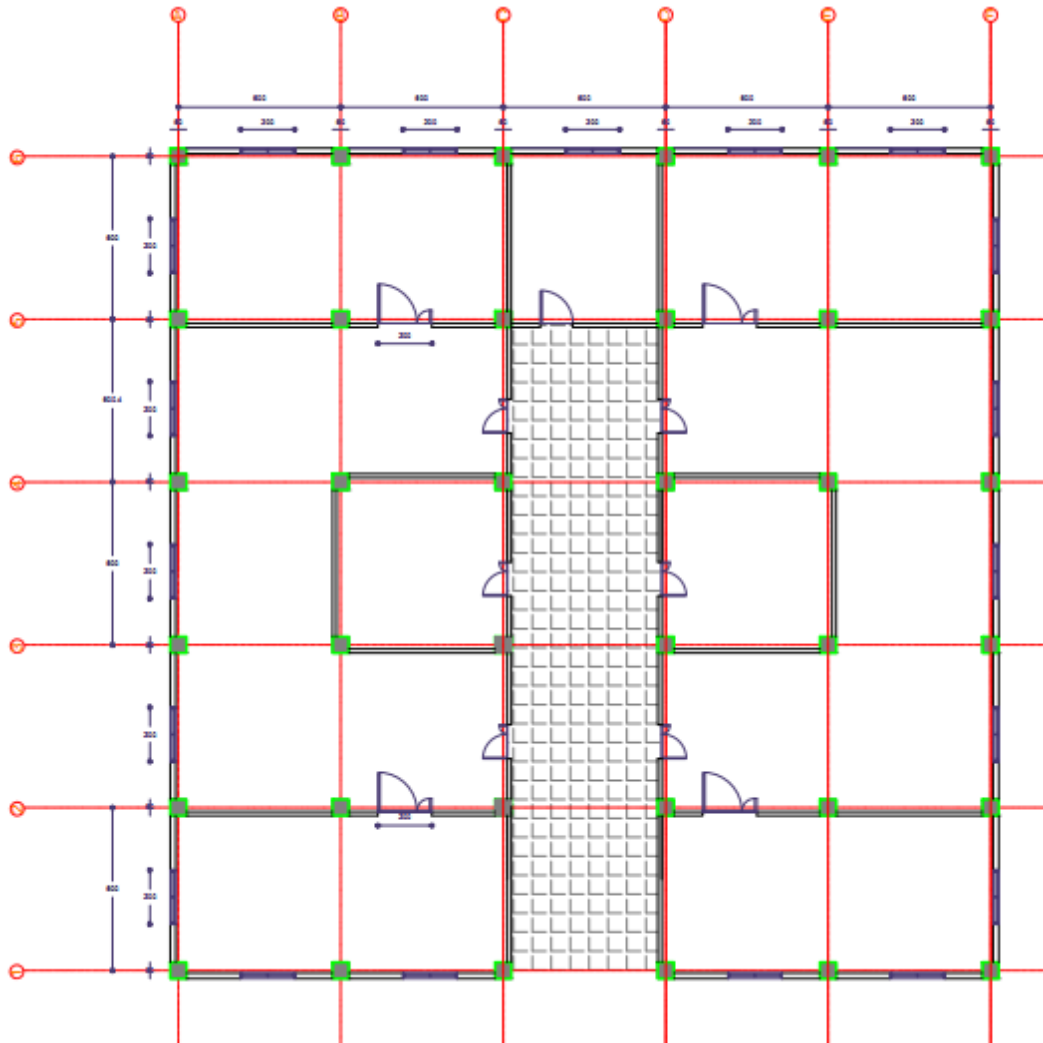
Typical floor plan for base structure of infilled frame model
